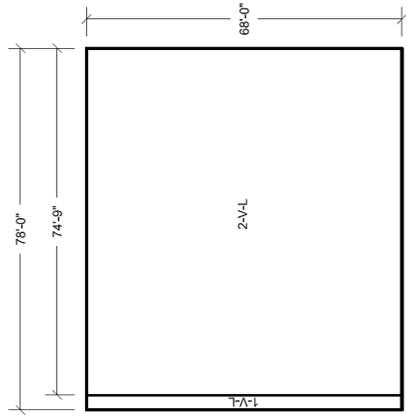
H.6-74: PUMP HOUSE INTERNAL EAST WALL LOOKING WEST
